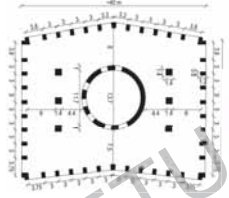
Structural Plan of Cayan Tower, drawn by Fatih Topak
